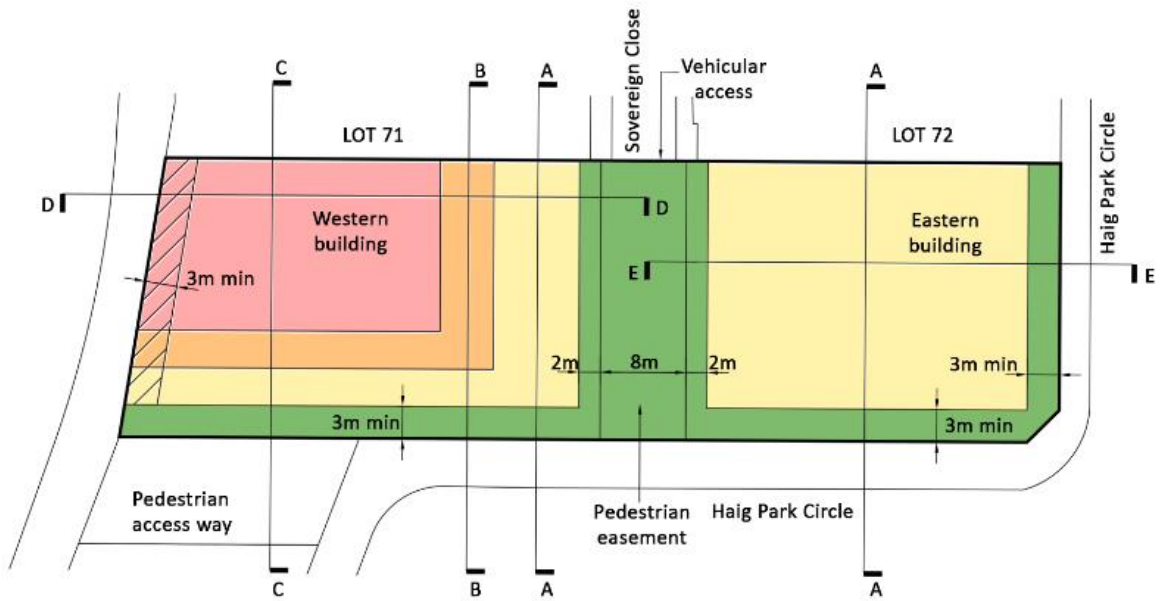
Lot 70 - Building setbacks and building envelope cross section locations.
